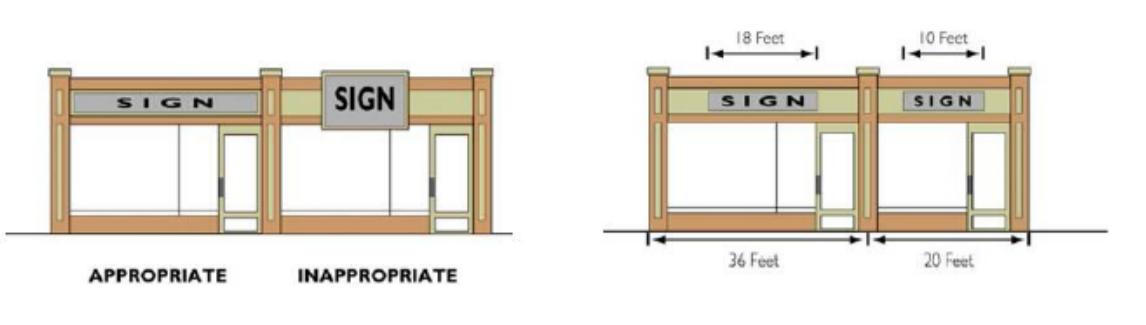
F-9-0-1 Appropriate Wall-mounted Sign Location on Building Frontage
